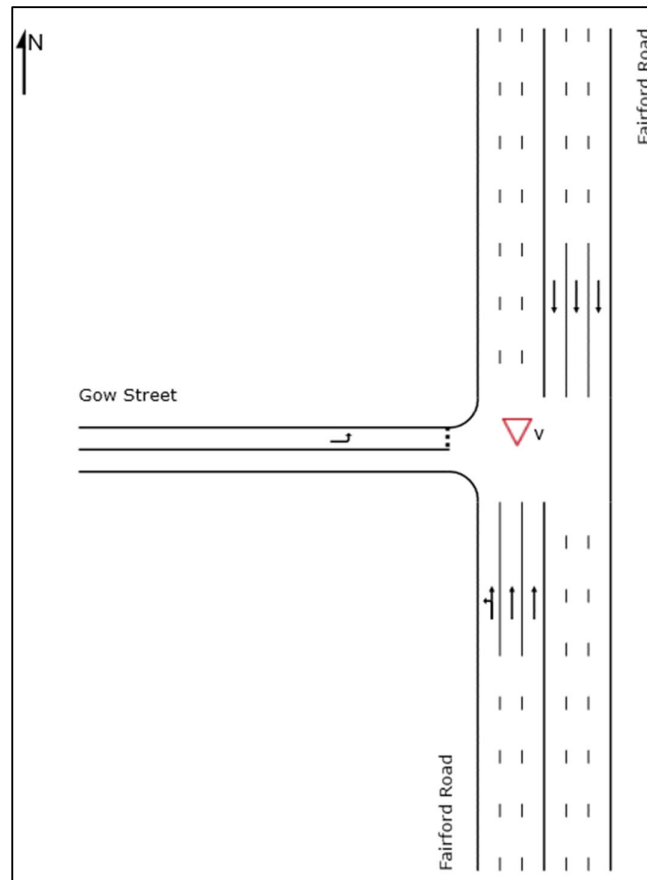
Priority Intersection of The Fairford Road with Gow Street (SIDRA)
